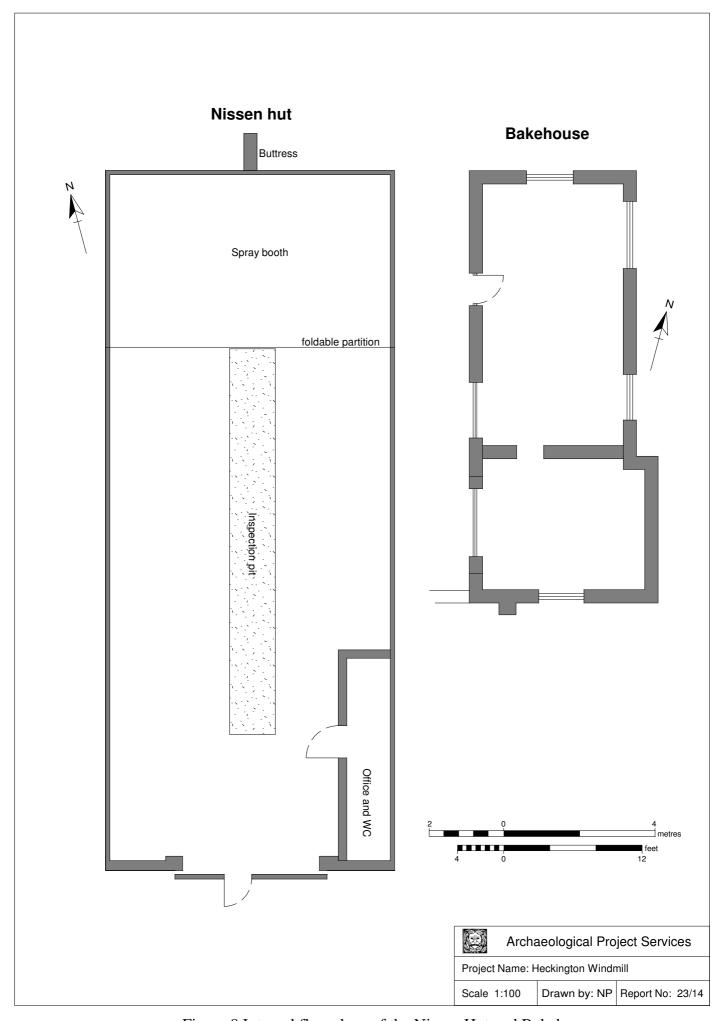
Internal floorplans of the Nissen Hut and Bakehouse
